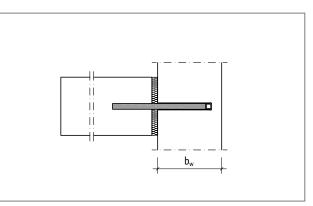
Schöck Dorn type LD: Minimum structural component thickness of a wall or column
